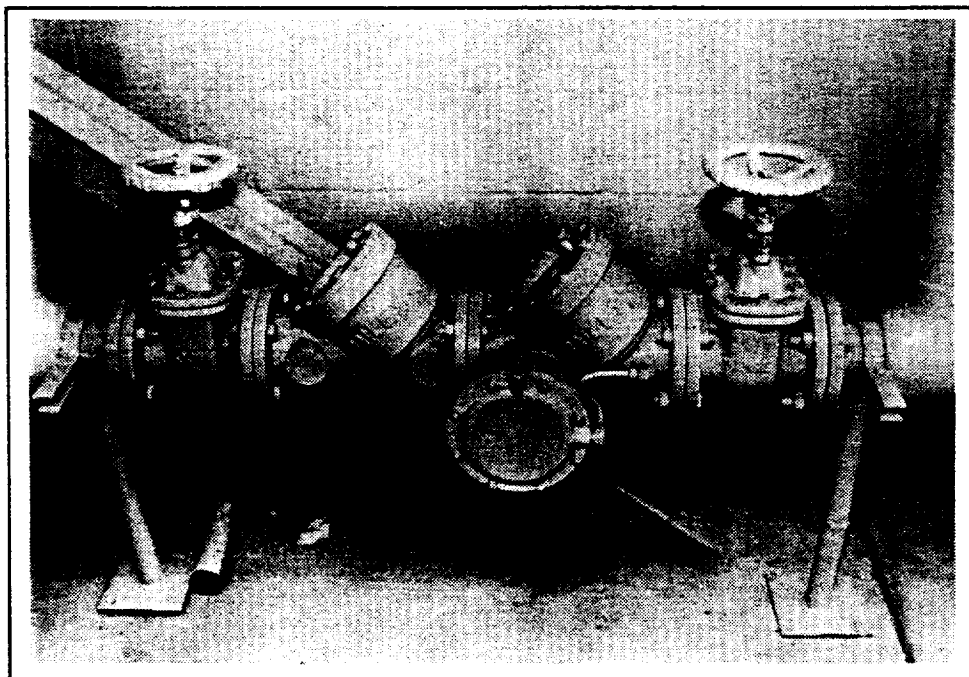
Typical Large Size Reduced Pressure Backflow Assembly.
